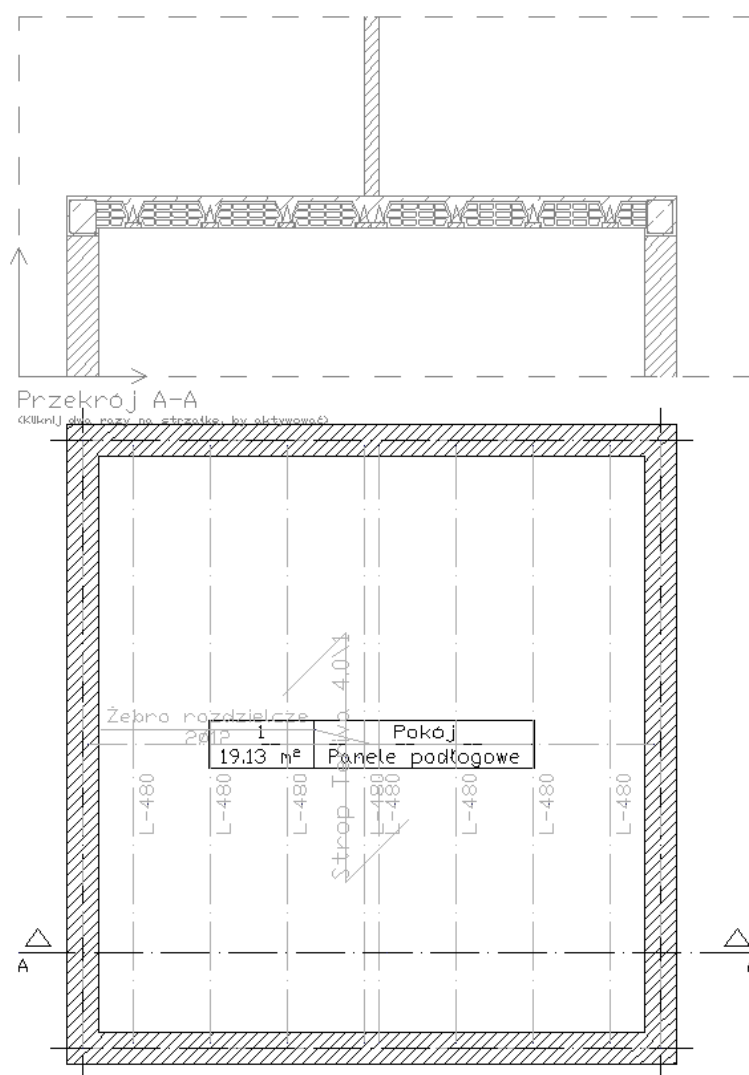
Sample drawing of reinforcing beam under partition wall of thickness above 12 cm
